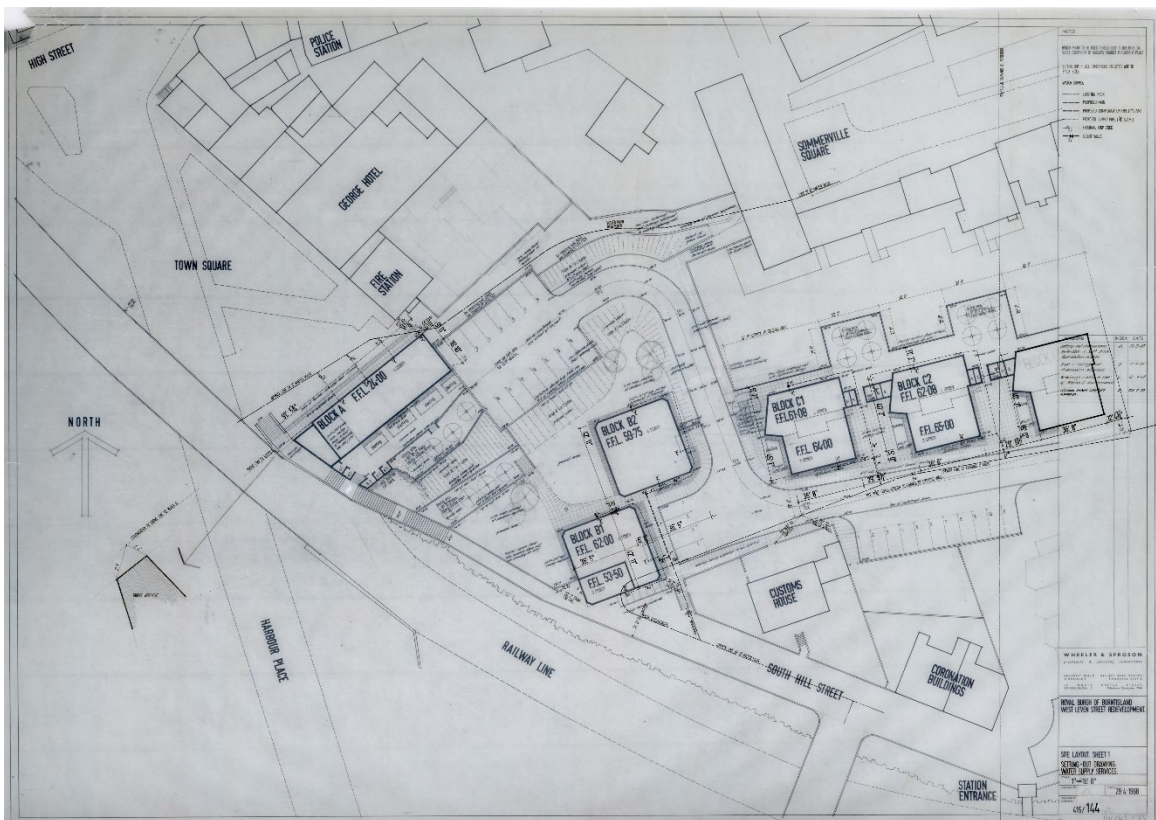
West Leven Street Phase 1 'Site Layout' showing Blocks A, B1, B2, C1, C2 and C3, 29 April 1968.
